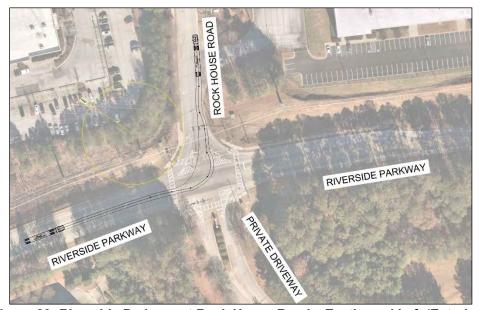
Riverside Parkway at Rock House Road – Eastbound Left (Entering)
